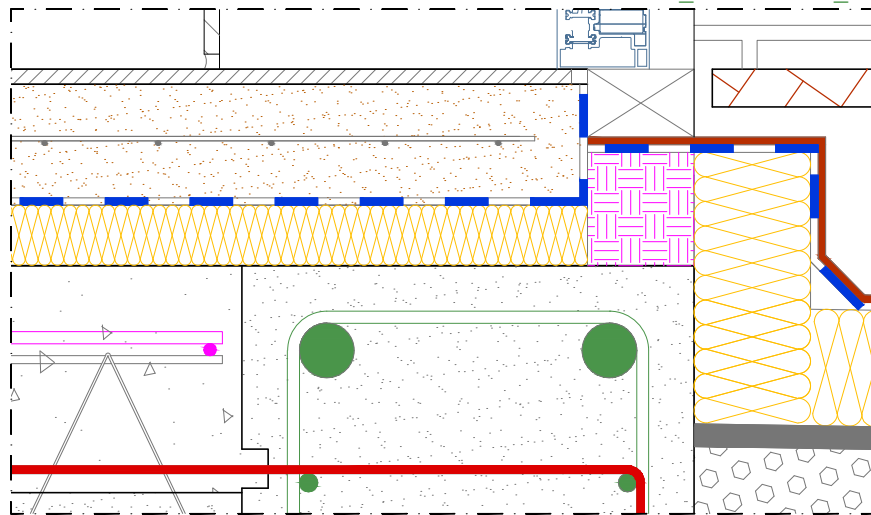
UNION PREFABRICATED STAIR-IN SITU WALL \_S:1/10
